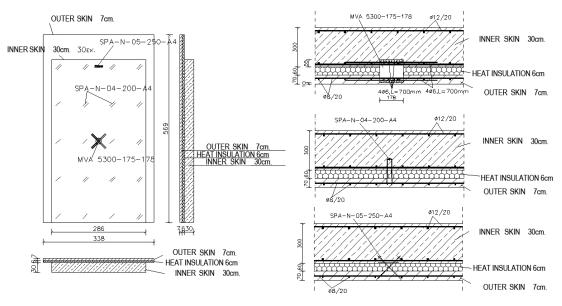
"Sandwich"-type wall: Elevation and typical sections
